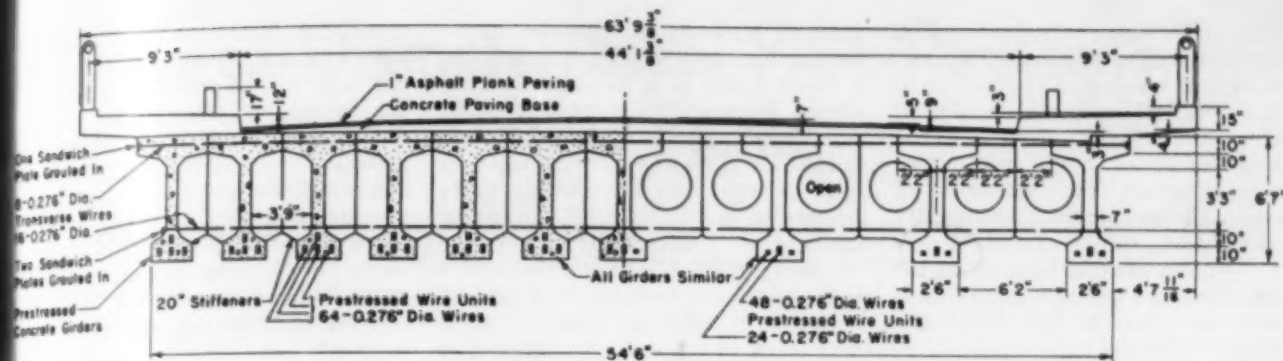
SPANS CONSIST OF identical prestressed girders 6 ft 7 in. deep, weighing 150 tons each. Girders are cast separately, then tied together in place by high-strength wires. Main-span girders are spaced as shown at left of center line. Spacing of approach-span girders is shown at right of center line.
